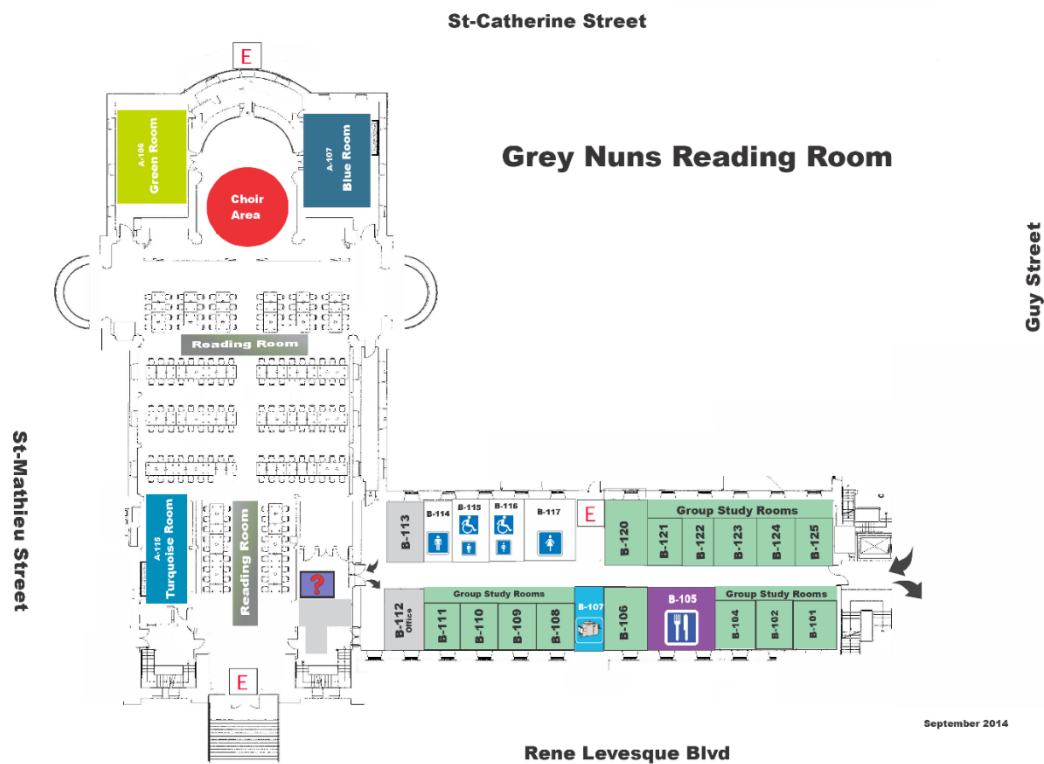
Details of the Grey Nuns first-floor plan (Facility management department, 2019)
